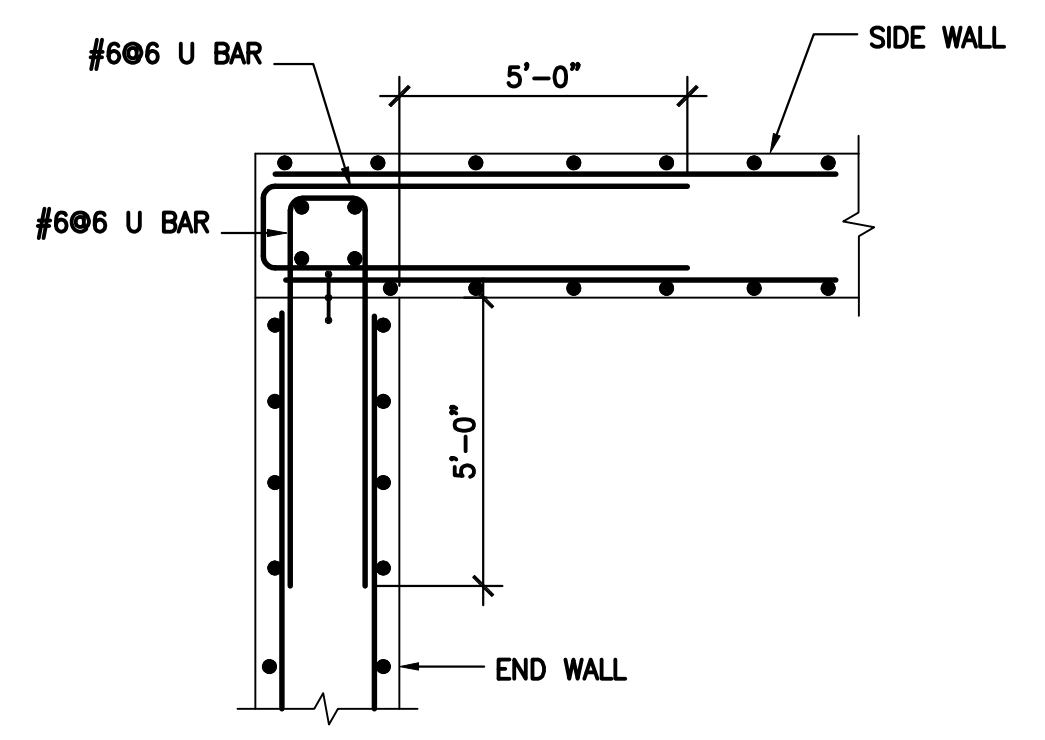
DETAIL TUNNEL/EAST CHAMBER AT HOLDING TANK (2)
